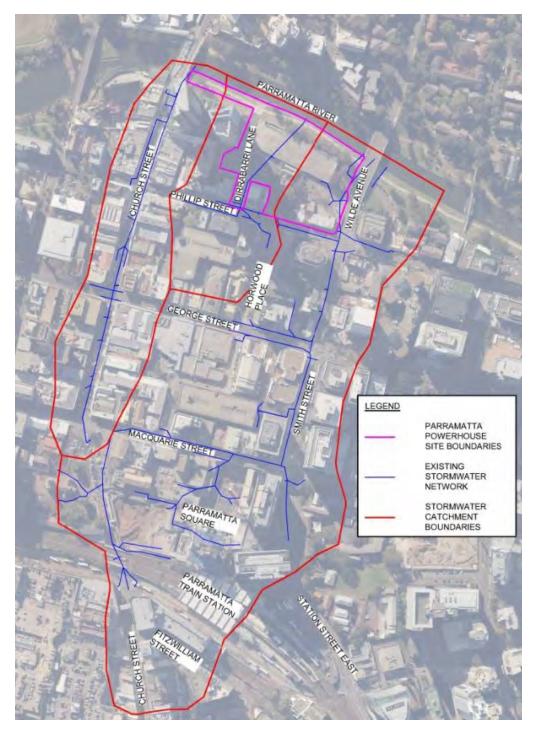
Existing stormwater drainage infrastructure catchment plan for areas in close proximity to the Powerhouse Parramatta development site
